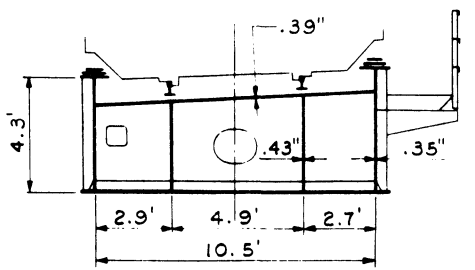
Railroad bridge over Alsstrasse, M-Gladbach, Germany. Span 80 ft. A three-cell steel box with rails bearing directly on upper flange of box
